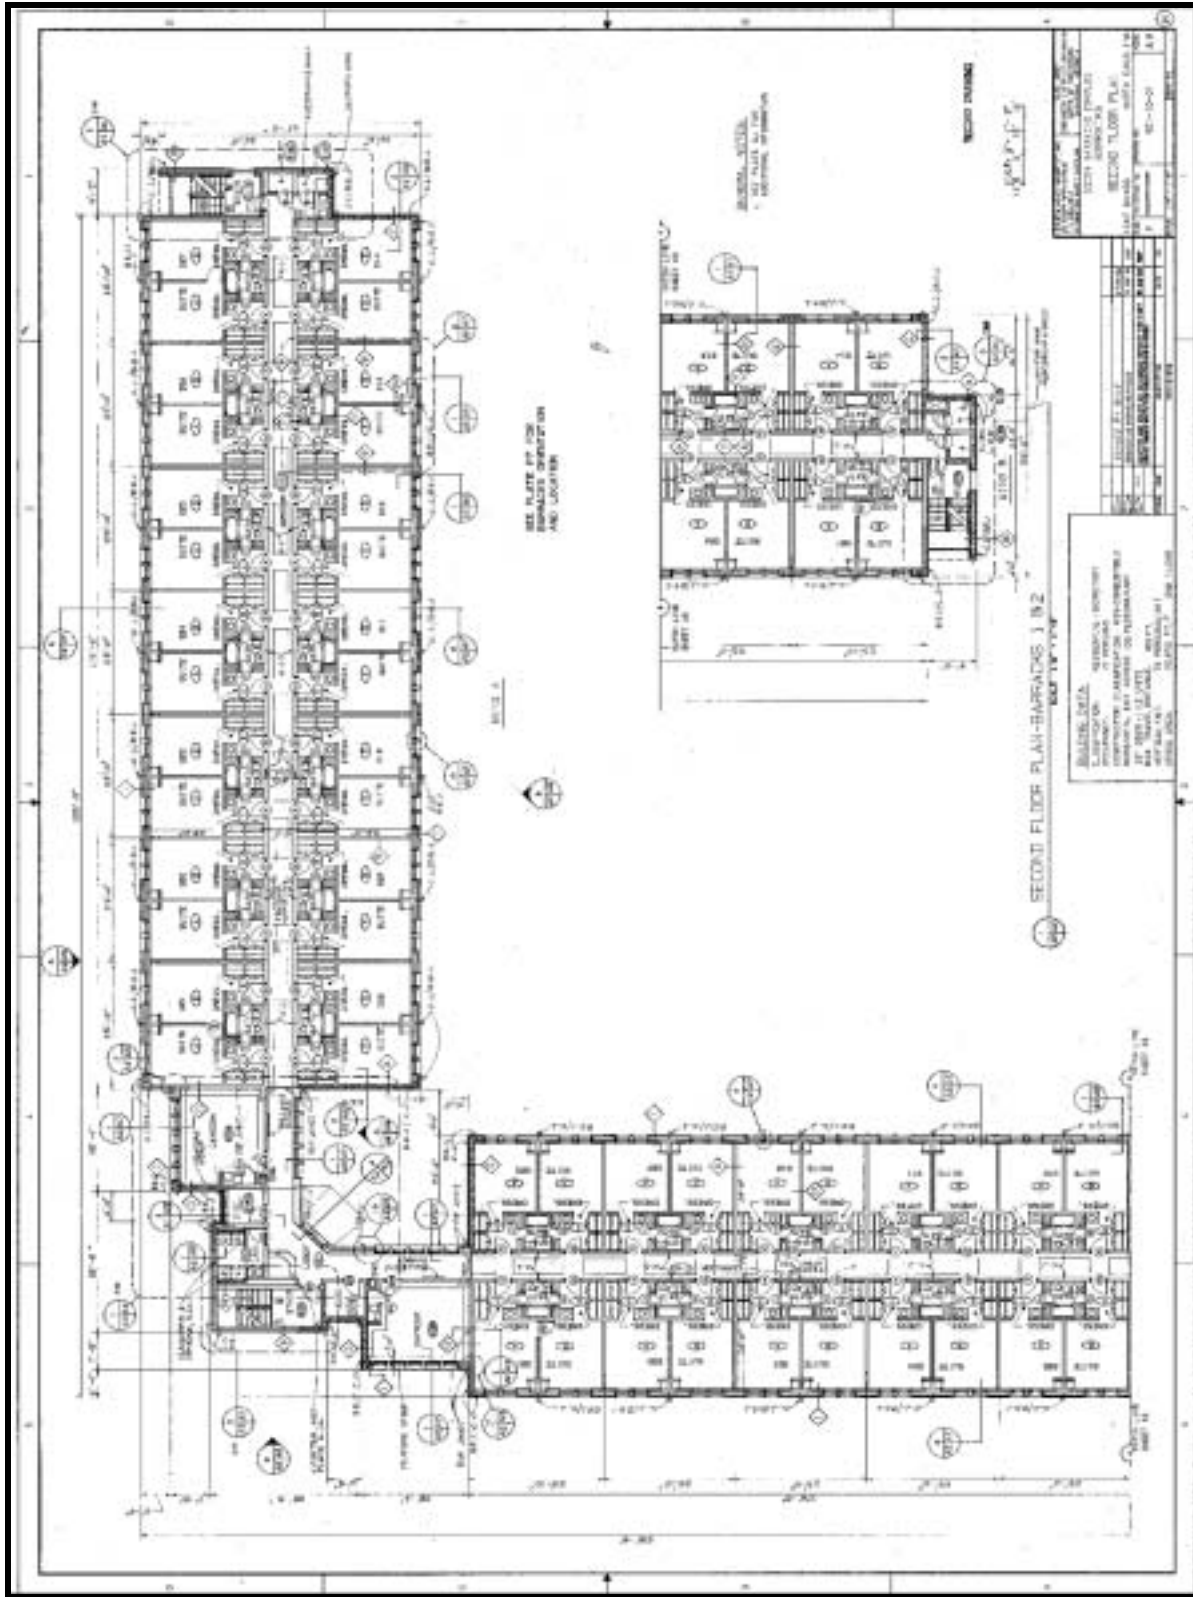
Double Quadrangle barracks, second floor plan, Ft. Bragg (1986, revised 1990) (Engineering, Ft. Bragg).
